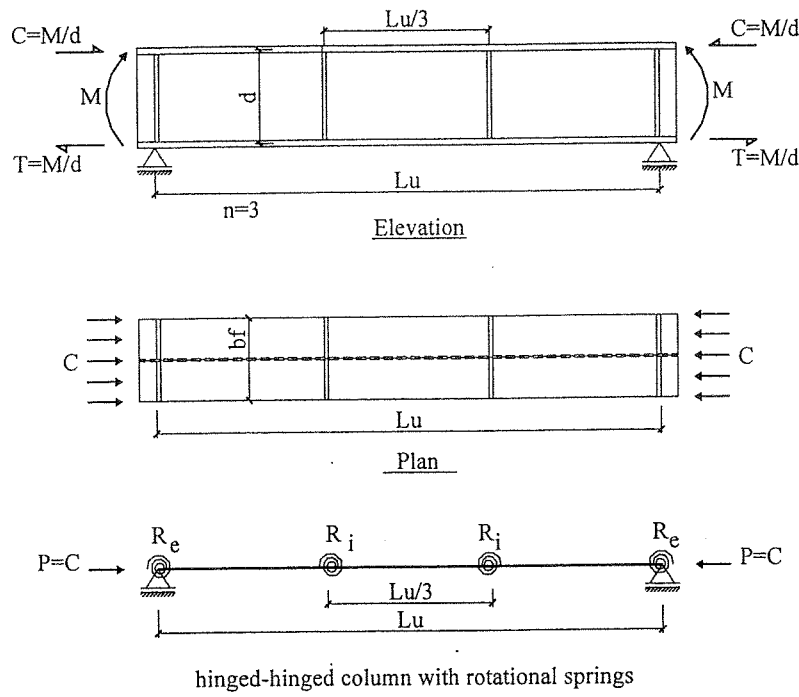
Modeling of Compression Flange of Stiffened I-Beams
